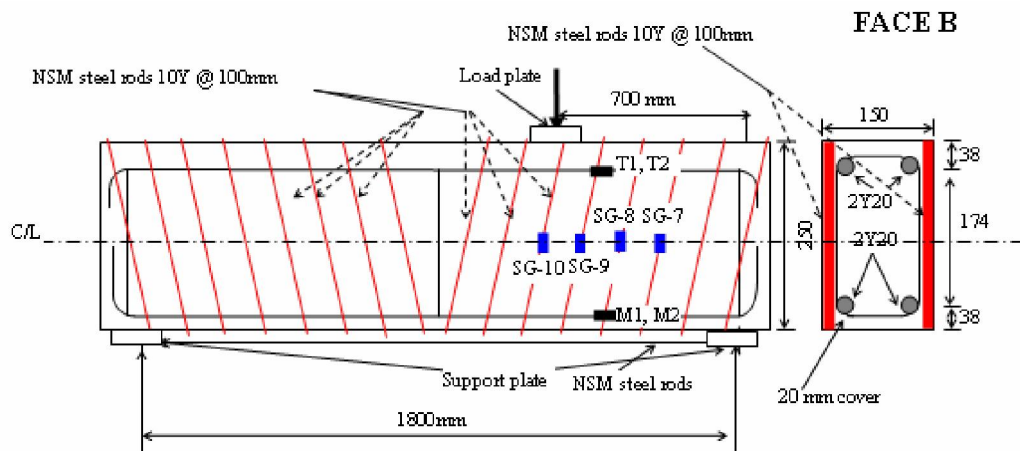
Arrangement of strain gauges on internal bars and NSM steel rods (Face B)
